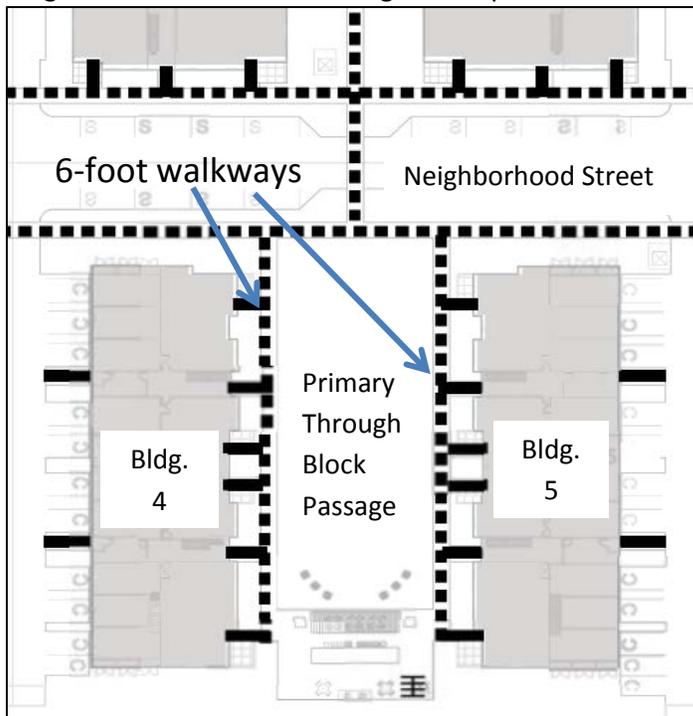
Modified Primary Through Block Passage at Central Greenspace
